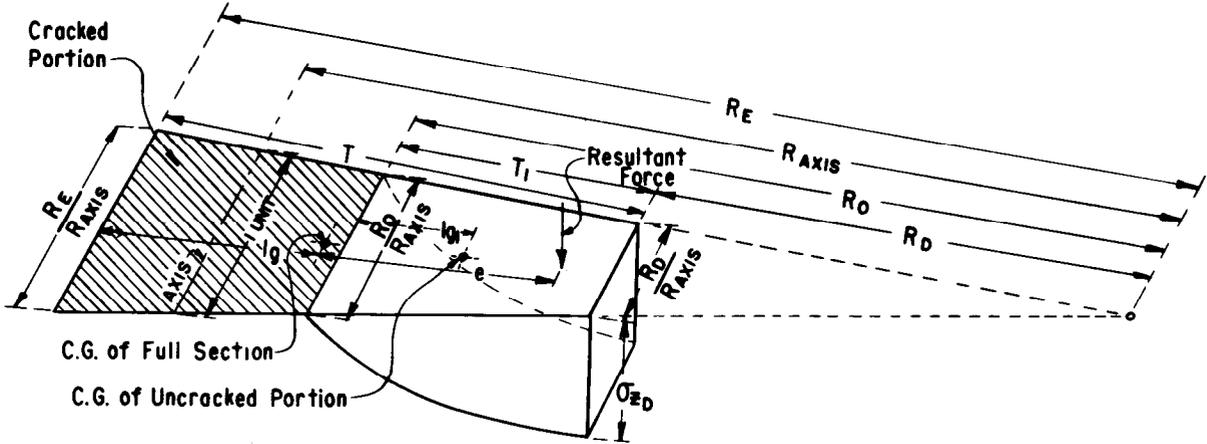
Horizontal section of a cantilever cracked from the upstream face (assuming parabolic stress distribution).—288-D-2976
